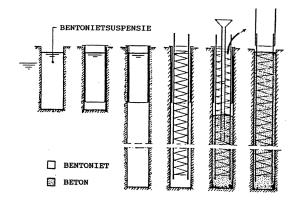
Installation method for drilled concrete piles [van Tol, 2006]
